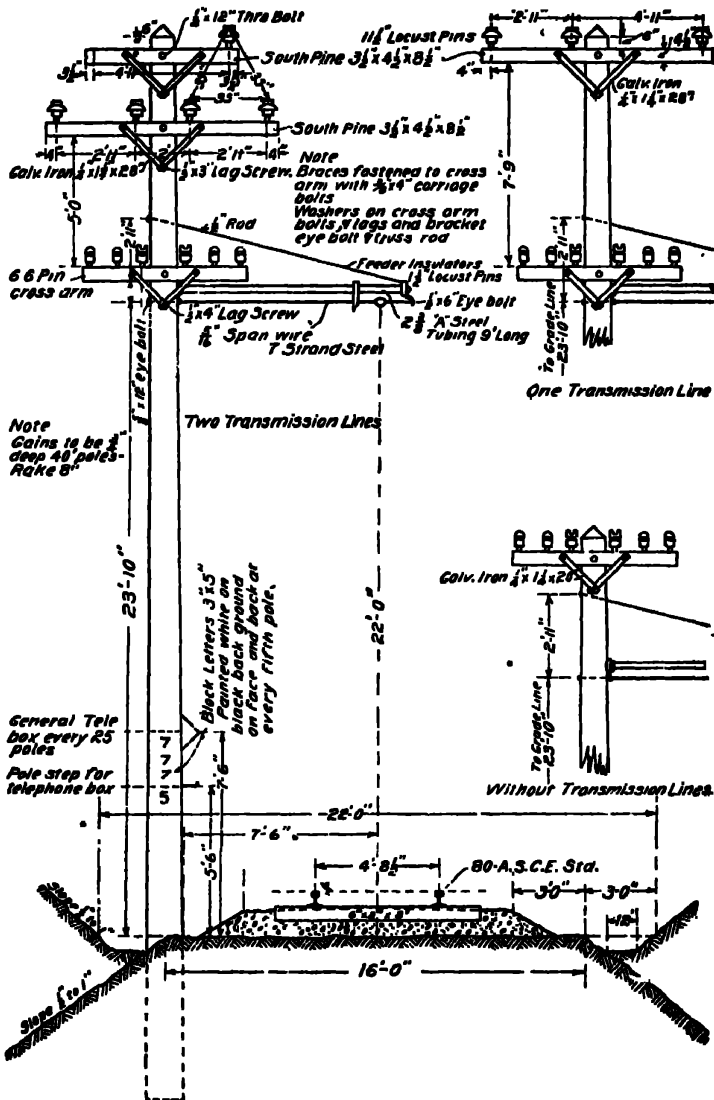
Diagram of Construction of Single-Track Interurban Trolley Road
